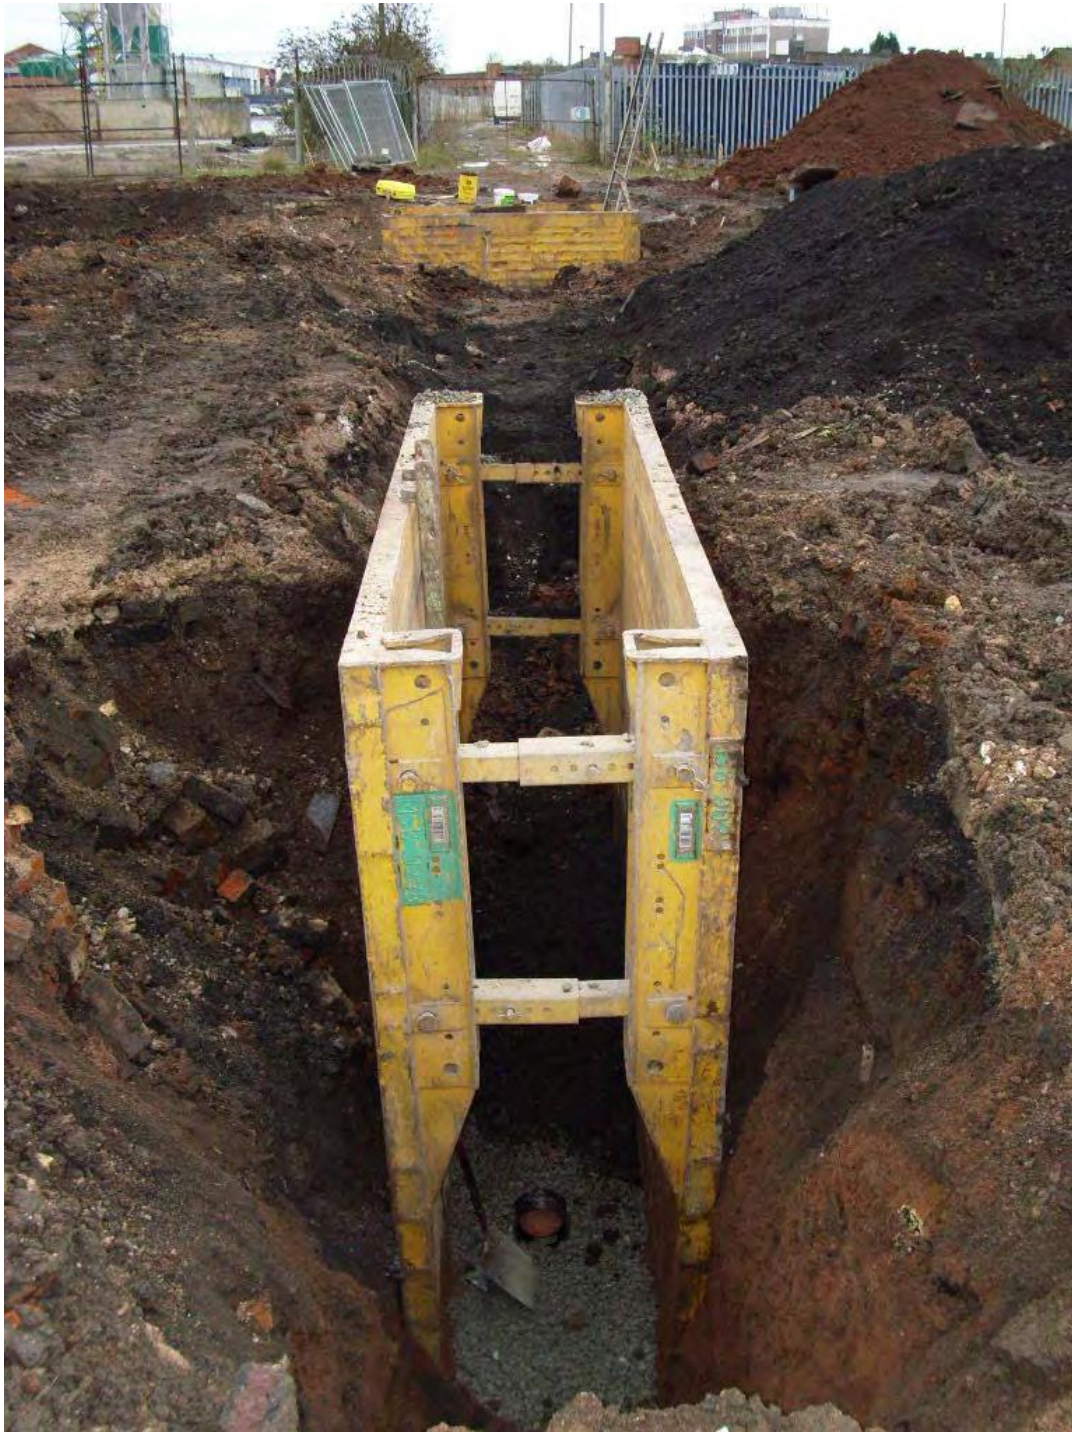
Showing a section of the foul sewer trench to the west of the site. Modern overburden can clearly be seen in the sides of the trench. Looking west.
